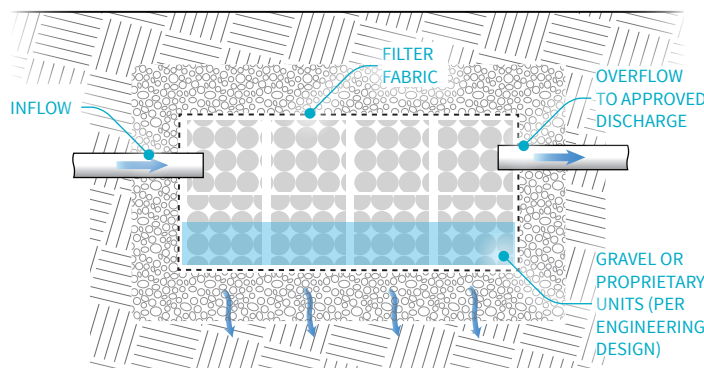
Schematic cross-section of a stormwater infiltration tank.
